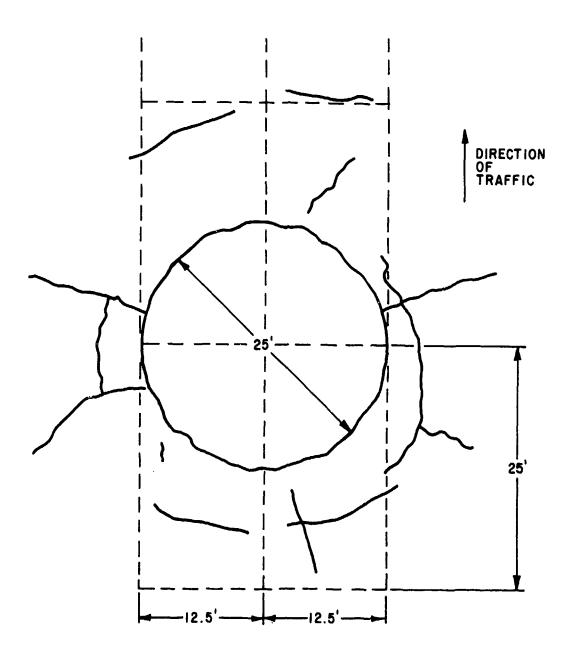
Cracking Pattern in Runway Slabs Surrounding Crater 2
